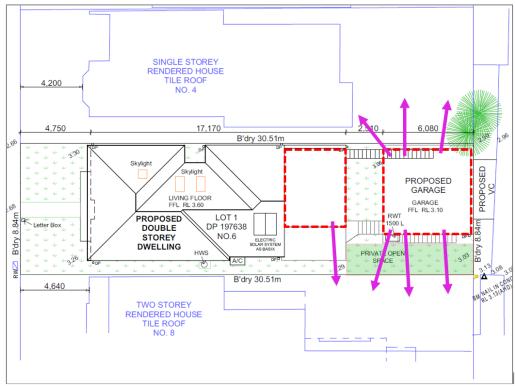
Site plan with elevated POS areas outlined in red. Sightlines indicated by arrows (Source: Benyana Building Design, overlay by Council).
